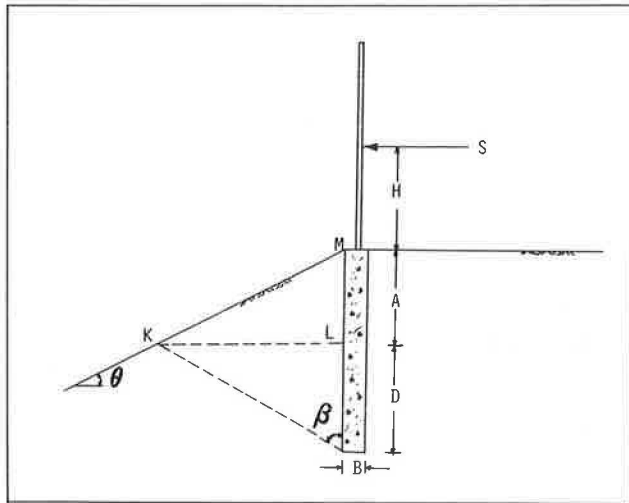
Geometry of modification in TRR 616 method for sloped ground.
